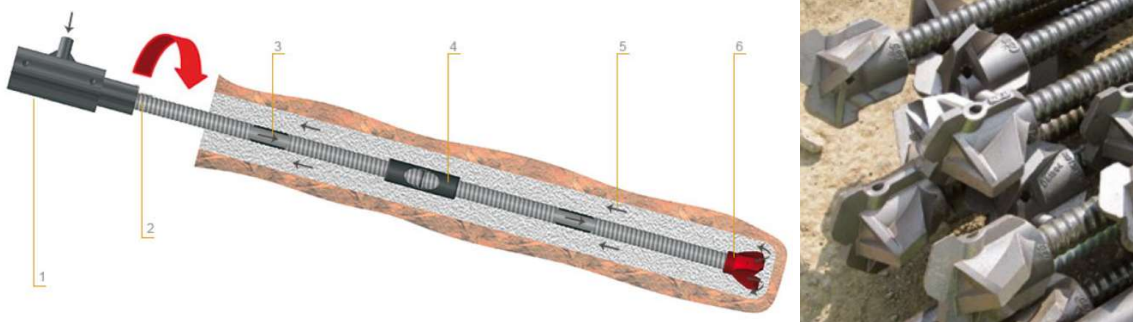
Details of the nails containing rods (source: website Dywidag)
